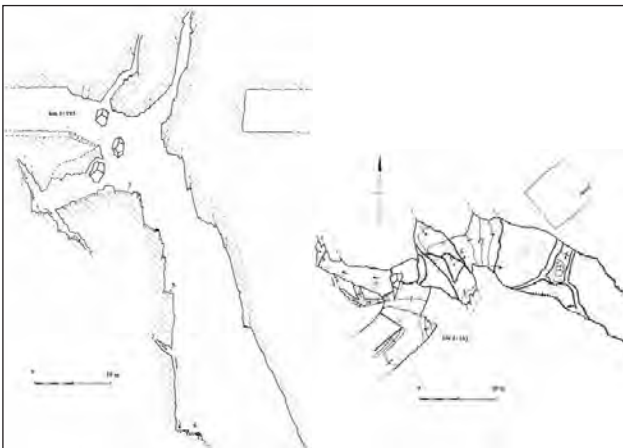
Cave profile and plan of cavern at km 1+193 in Biokovo tunnel.
